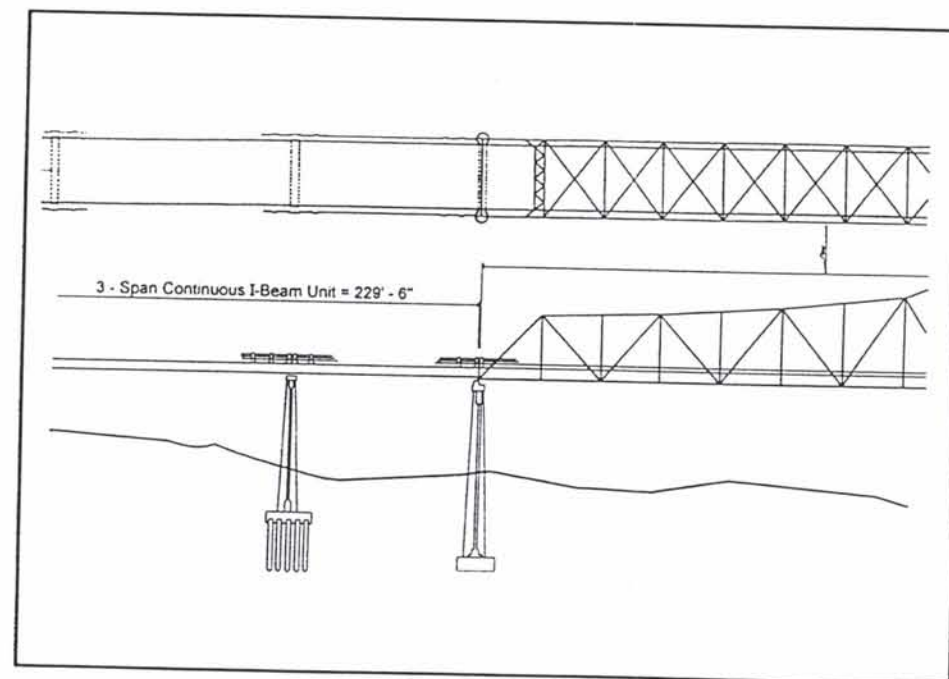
Elevation of the Colorado River bridge as shown in the 1940 plans.
